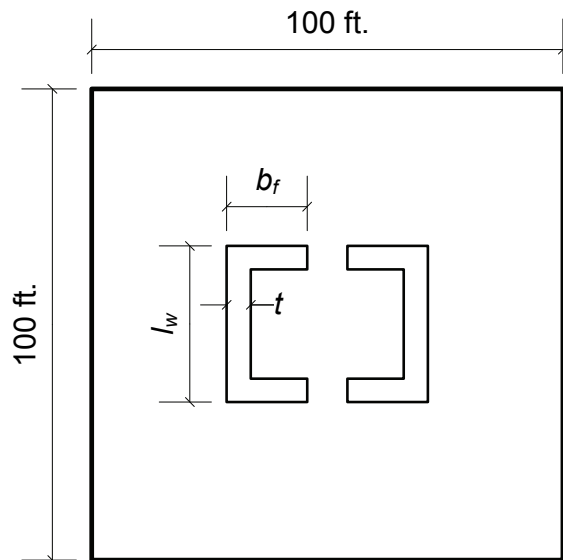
Plan view of special reinforced concrete core-wall archetype.
